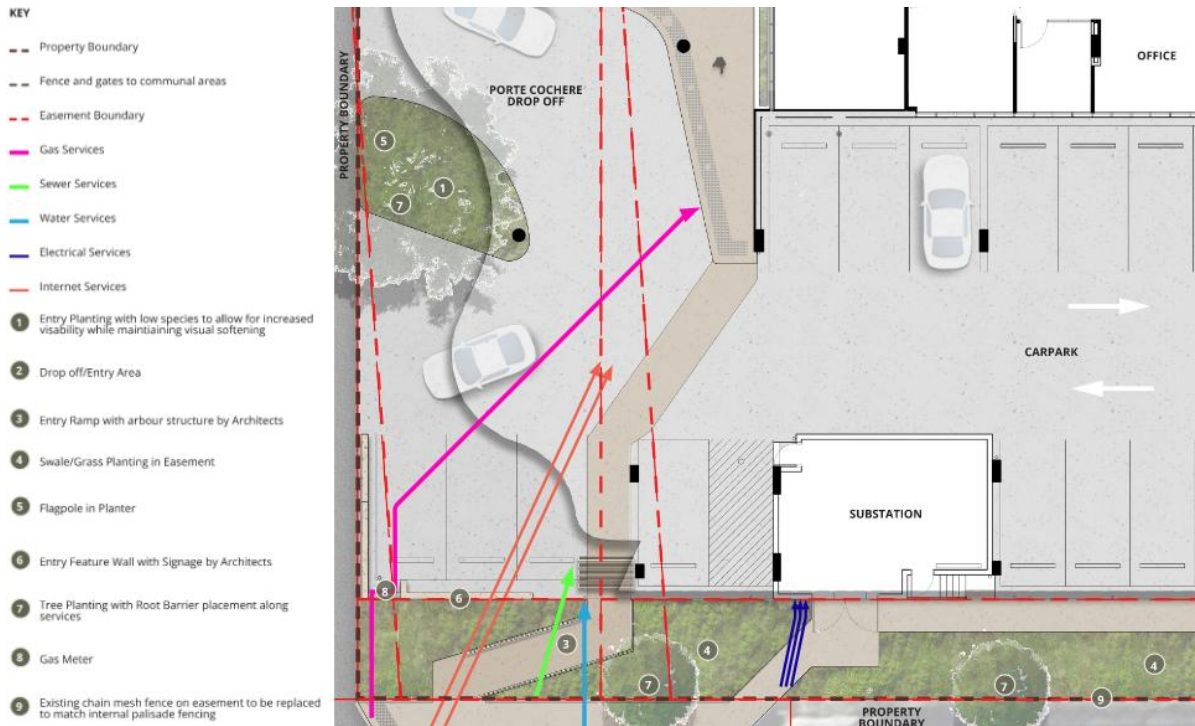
Proposed Landscaping Plan – Ground Floor (Detailed Plan 2) (Source: Arcadia)
